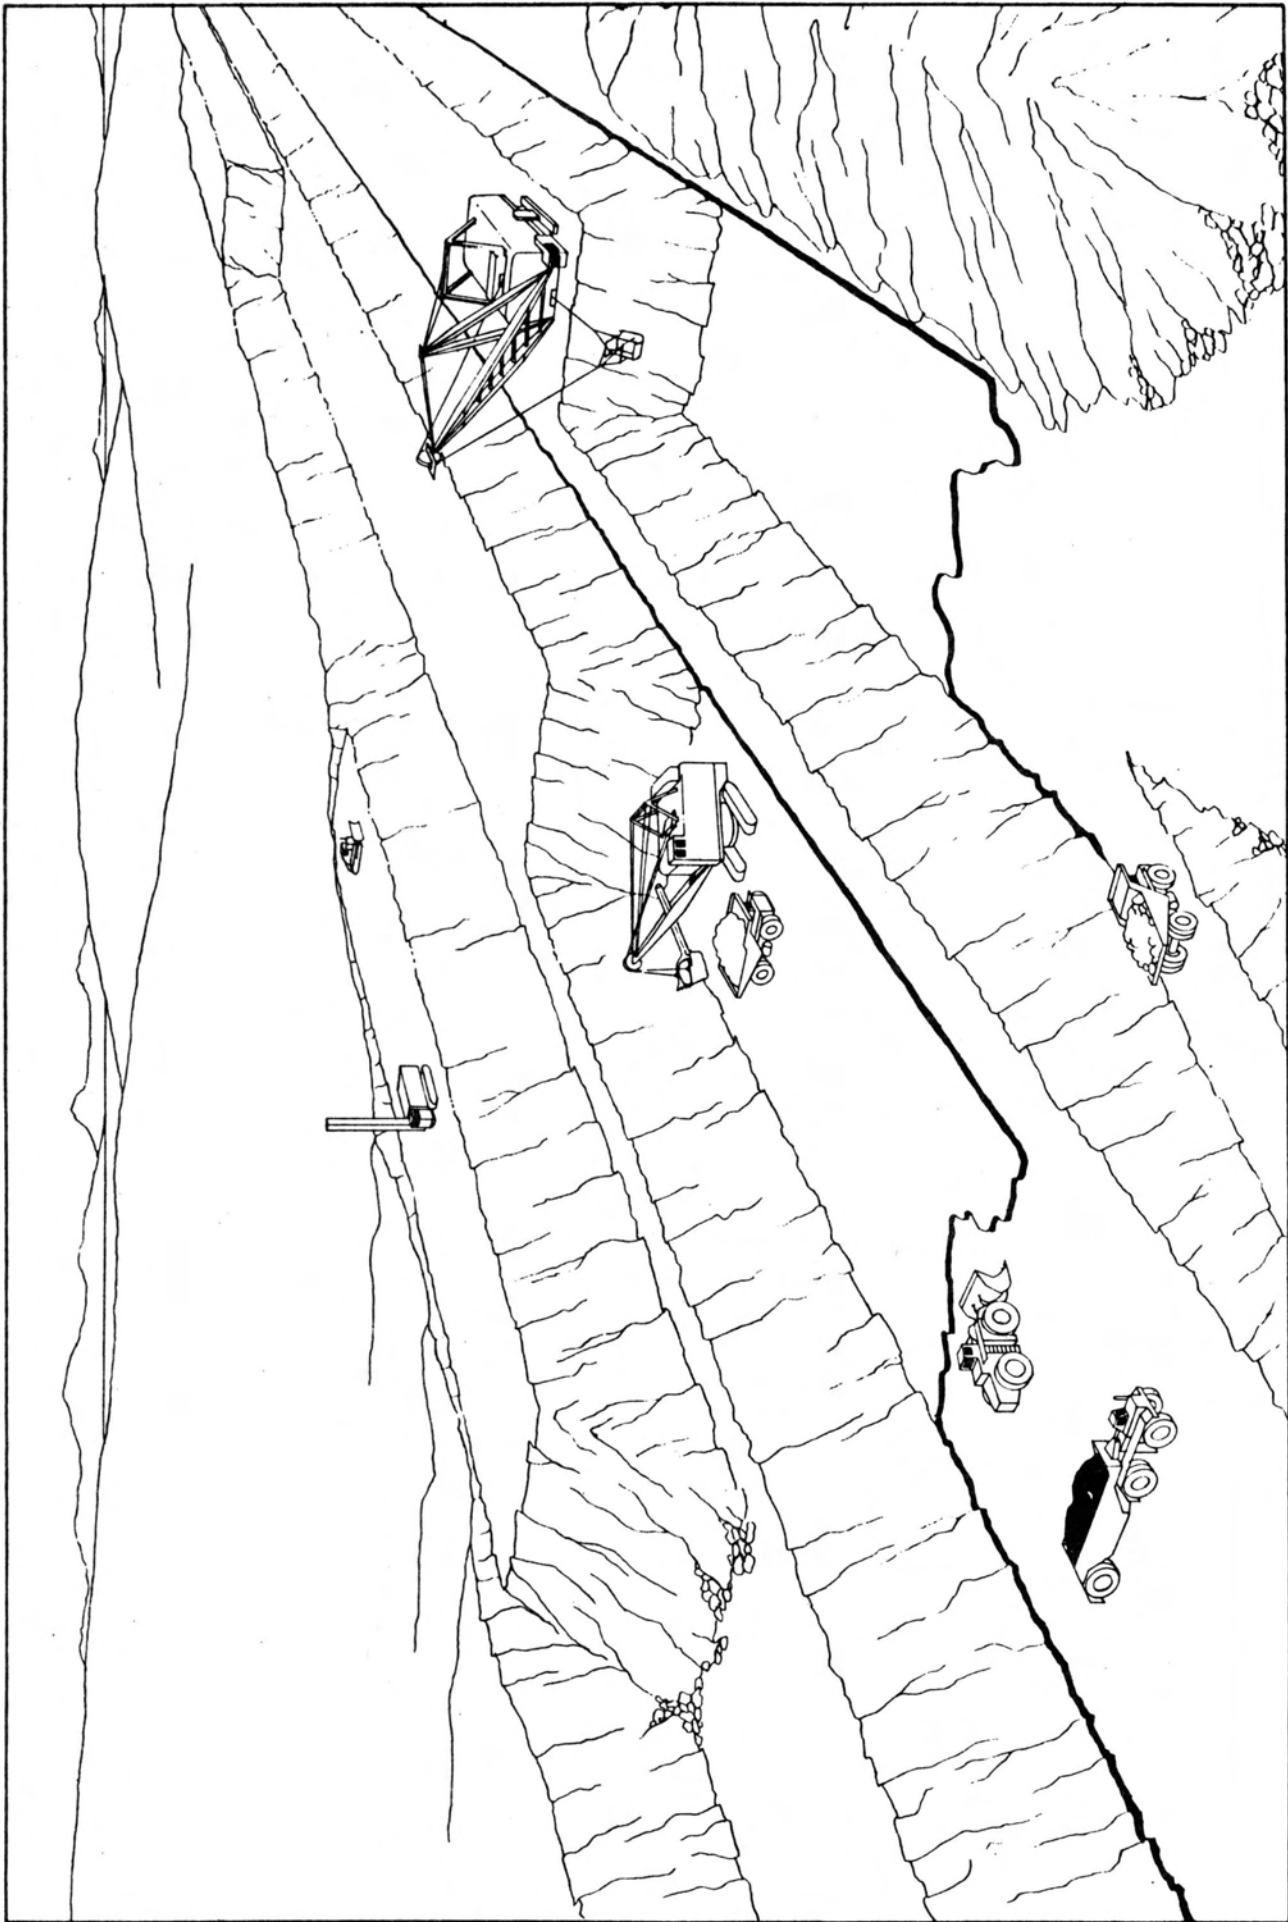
3 DRAGLINE - SHOVEL EXCAVATION
